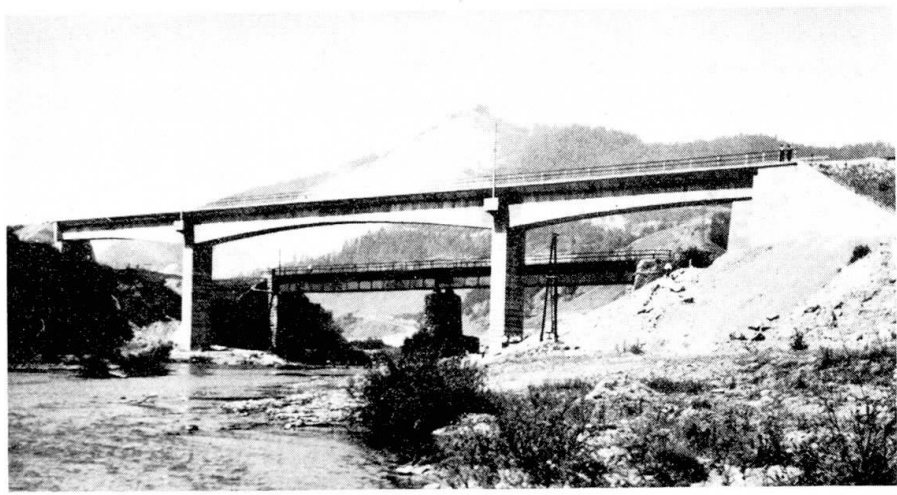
The cantilever prestressed concrete railway bridge " M " with precast elements.
